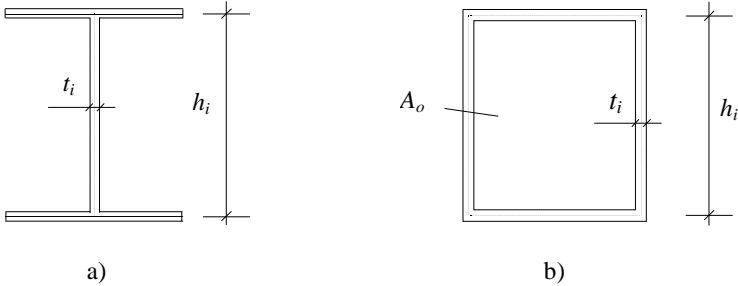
Cores of thin-walled wall sections. a) open cross-section, b) closed cross-section.
